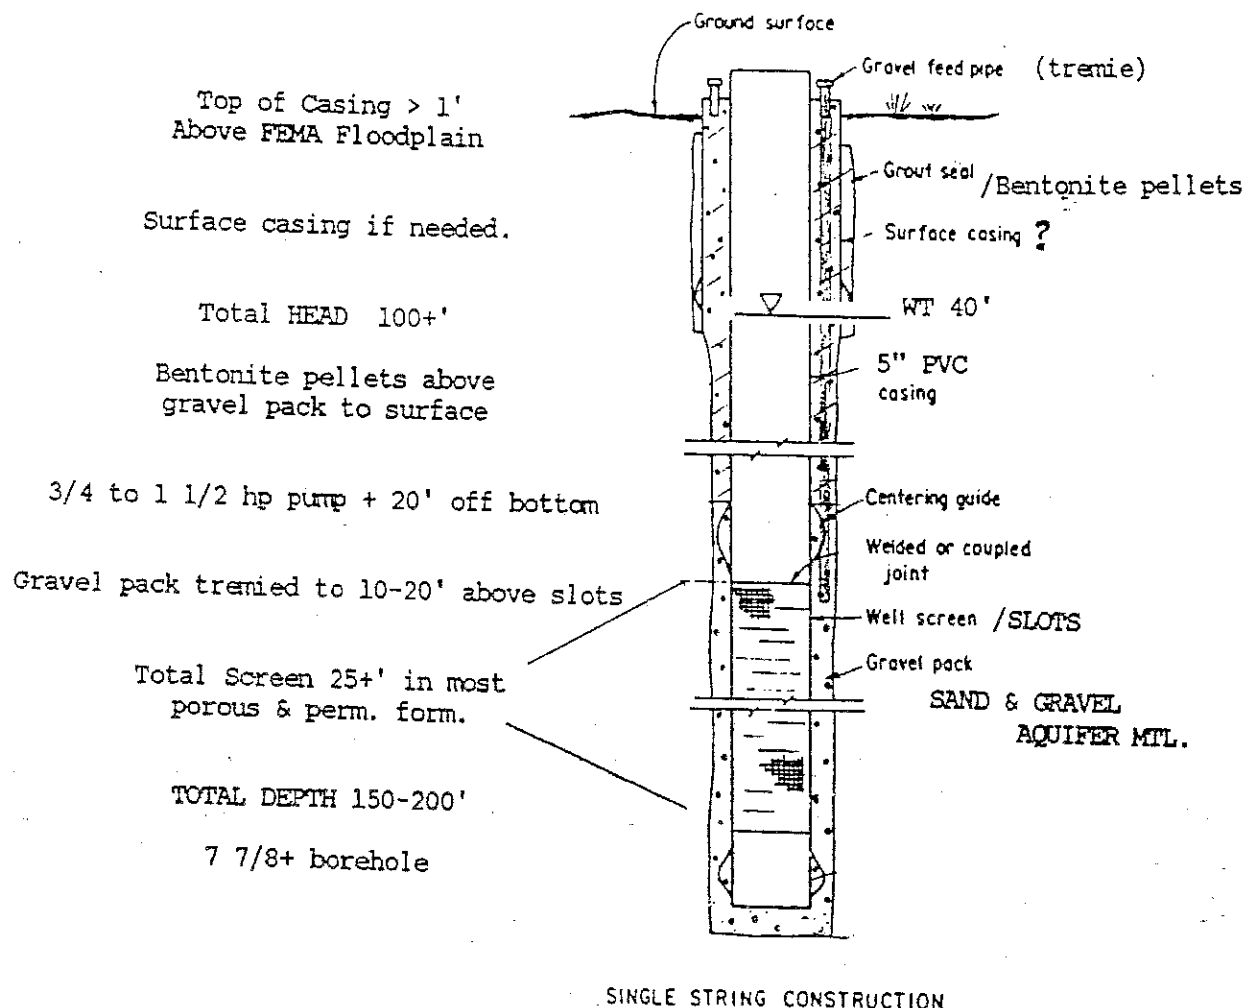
Gravel packed, rotary drilled well for single string construction. 103-D-1488.
